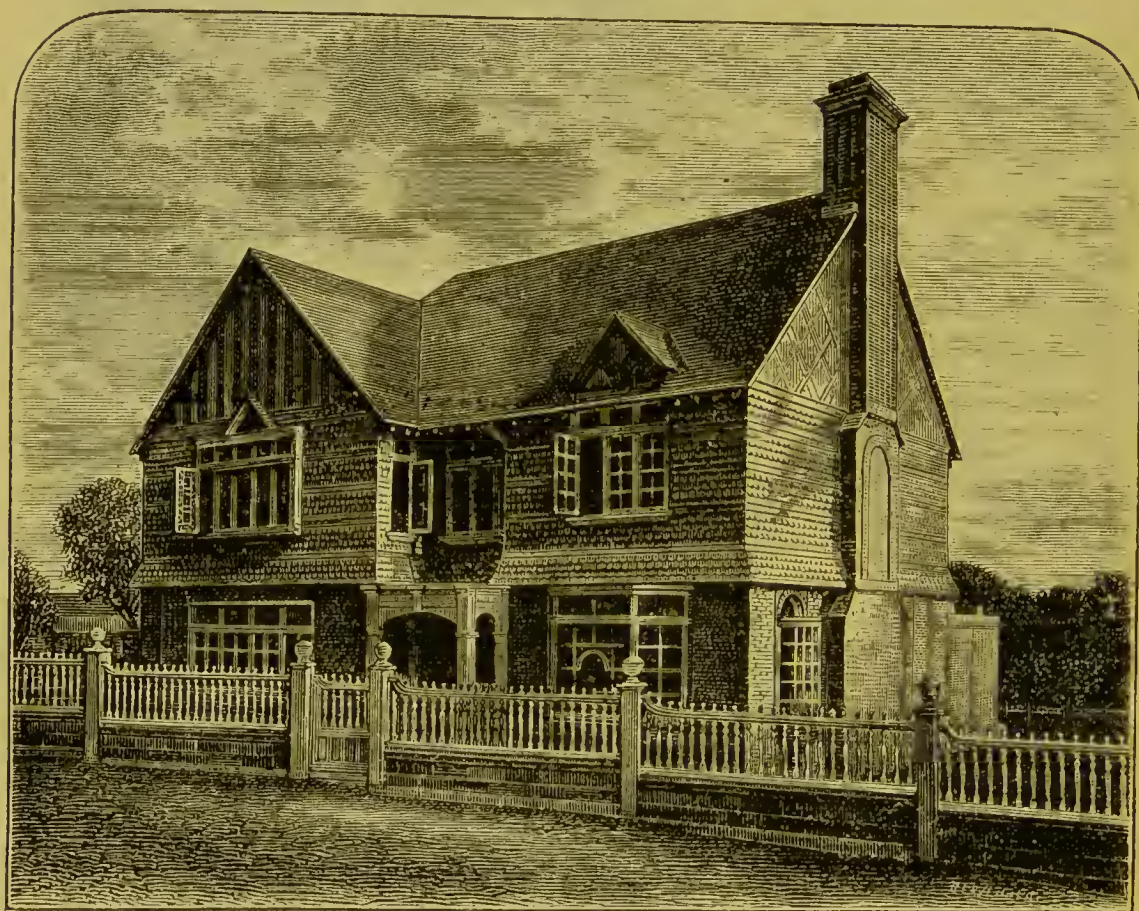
CONCRETE HOUSE AT CROYDON.
